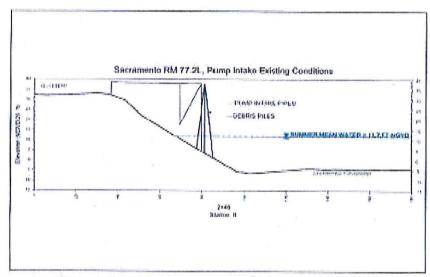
Existing conditions cross section at SAC RM 77.2L at the pump structure.
